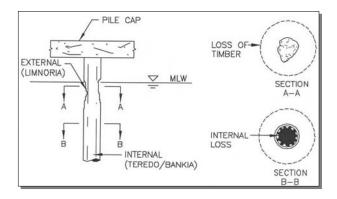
Typical Marine Borer Damage to Timber Piles
